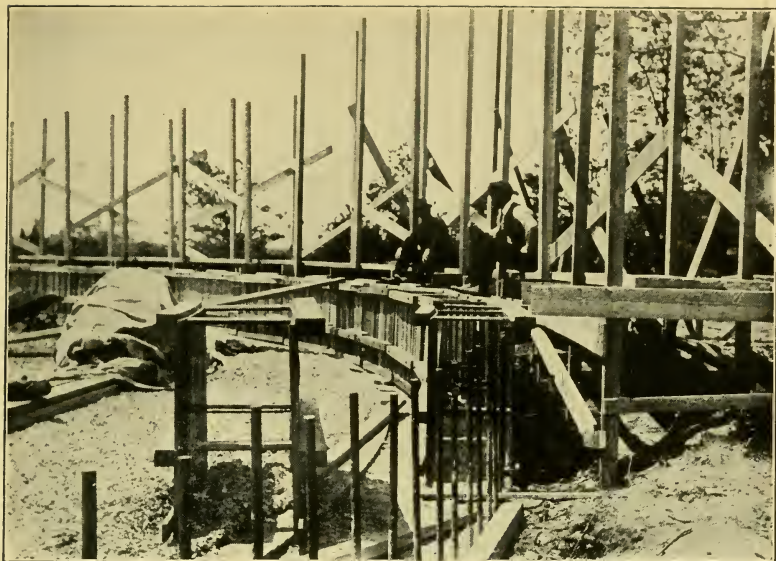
REINFORCEMENT AND FORMS AT BASE OF WALL.
